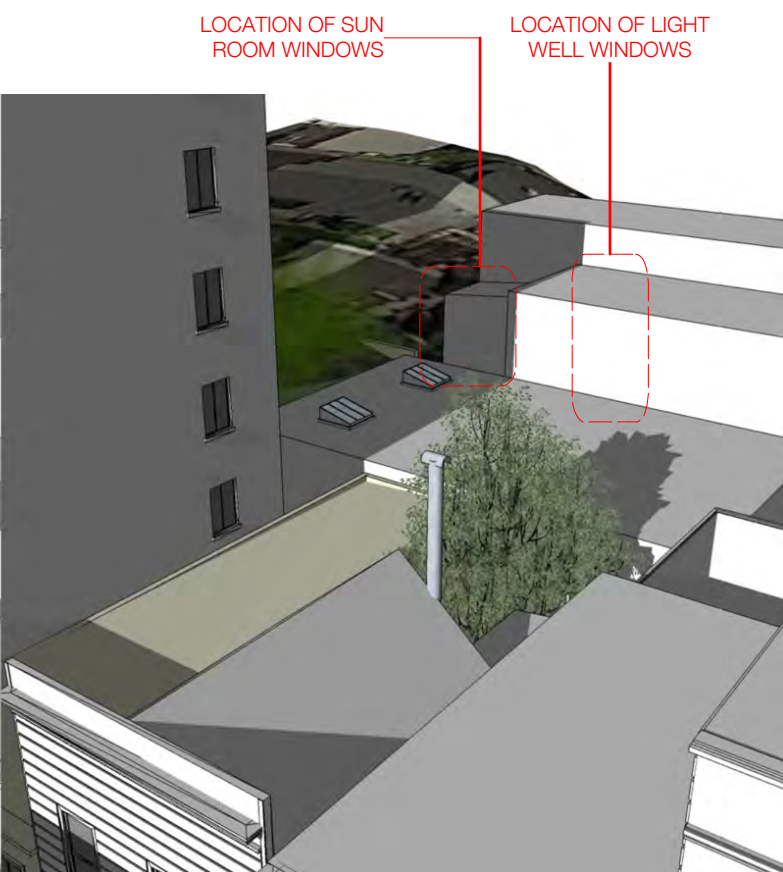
EXISTING SHADOWS - SEPT 1ST, 4:30PM
